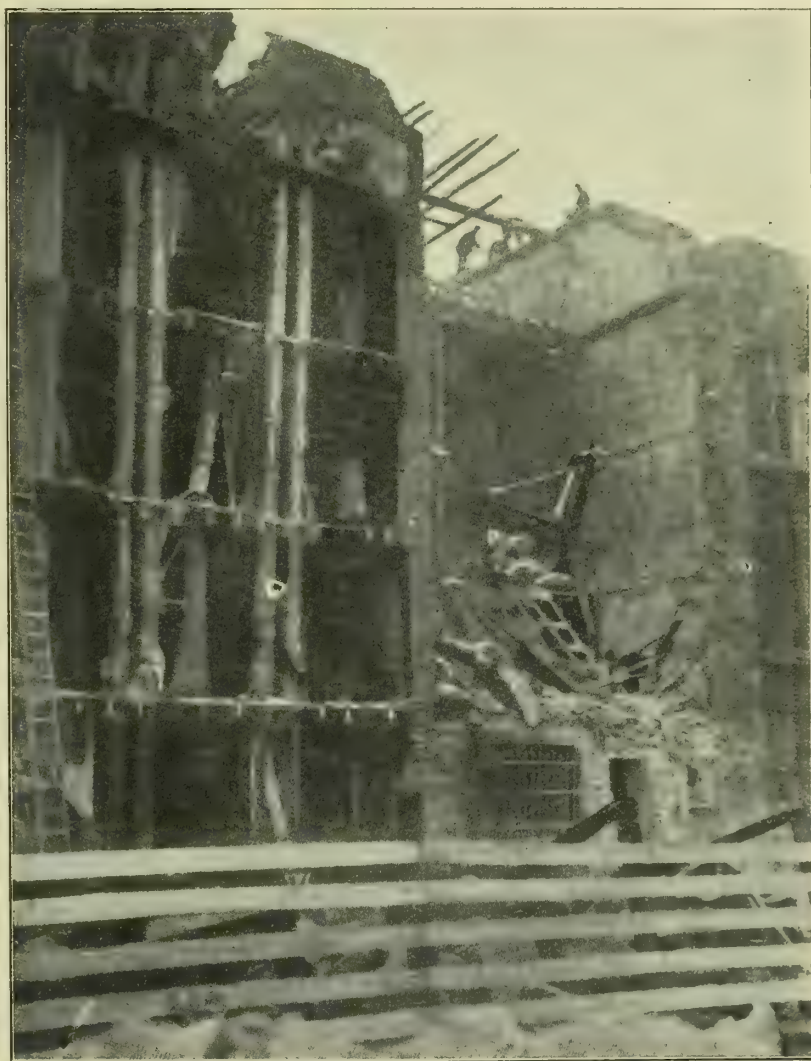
DUST EXPLOSION AT A GLASGOW PROVENDER MILL. VIEW OF WRECKED PREMISES.
